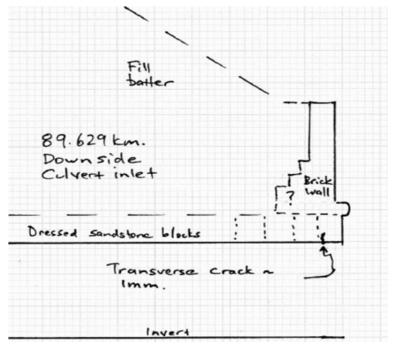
Sketch of the cross-section of the culvert 89.629 km headwall (source: PMLL Detailed Monitoring Report 46, Appendix E).
